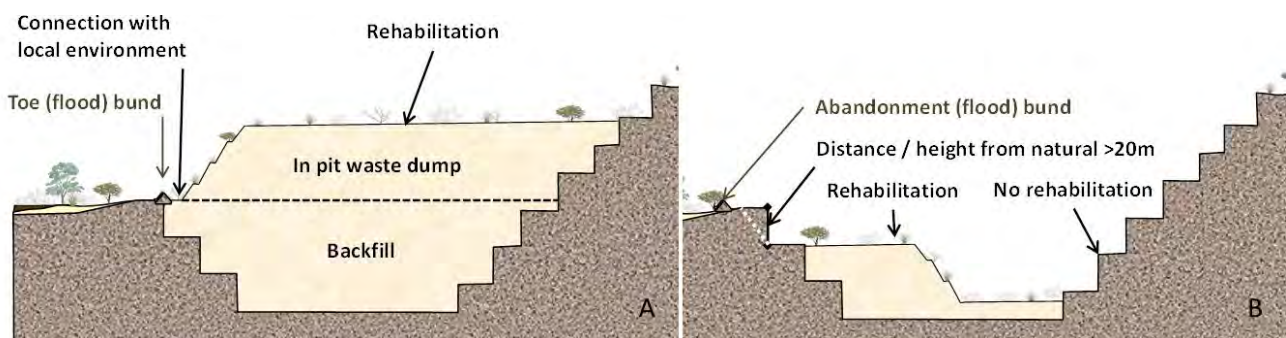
All waste dumps and backfill will be rehabilitated. Bare rock areas, such as the pit walls, will not be rehabilitated.
